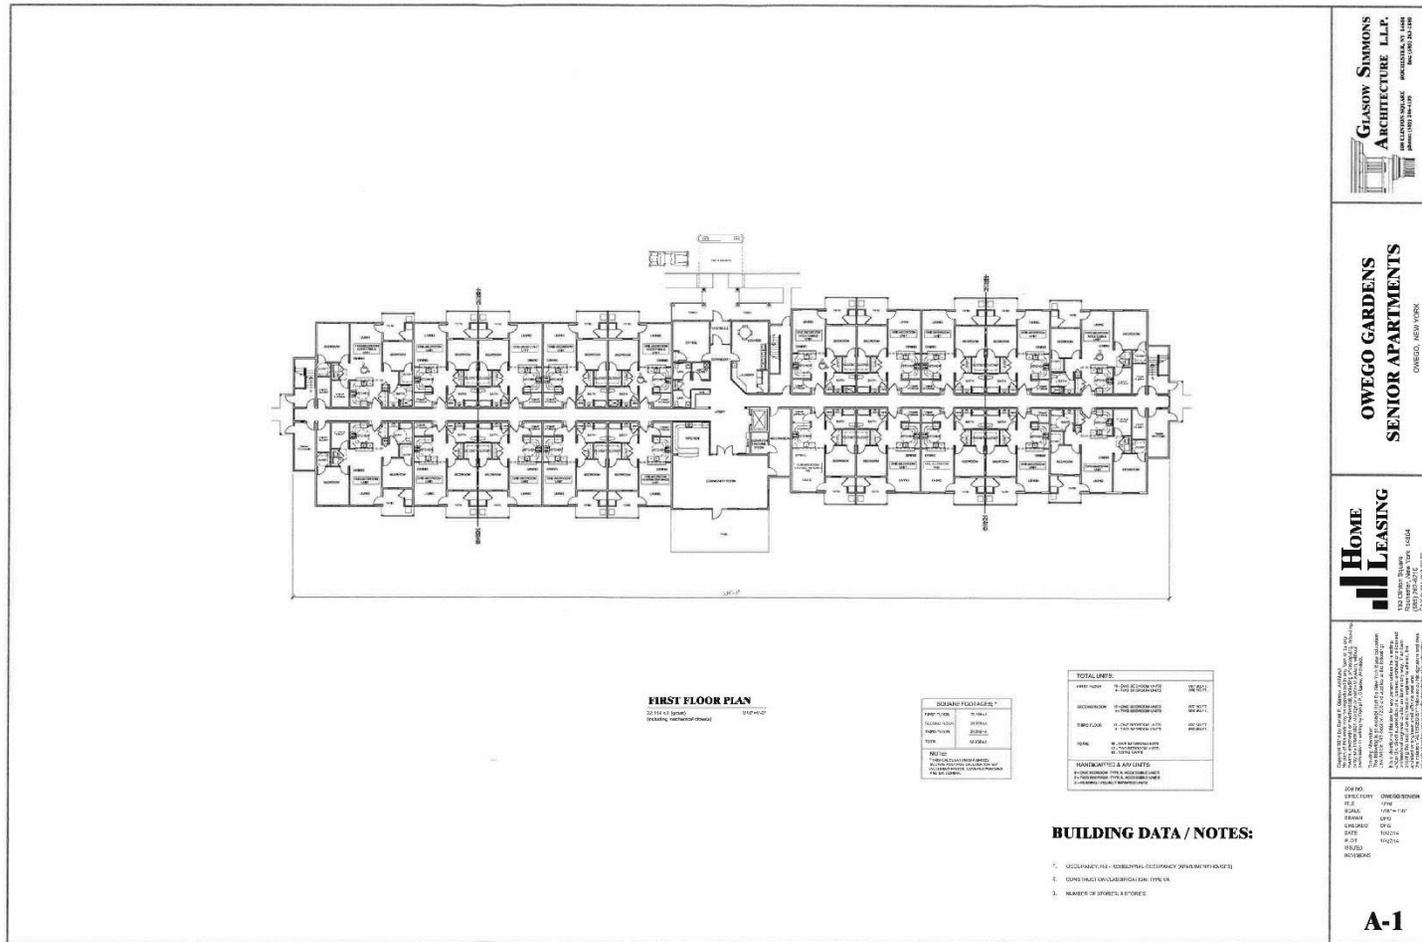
First Floor Plan of Proposed Owego Gardens Project.
